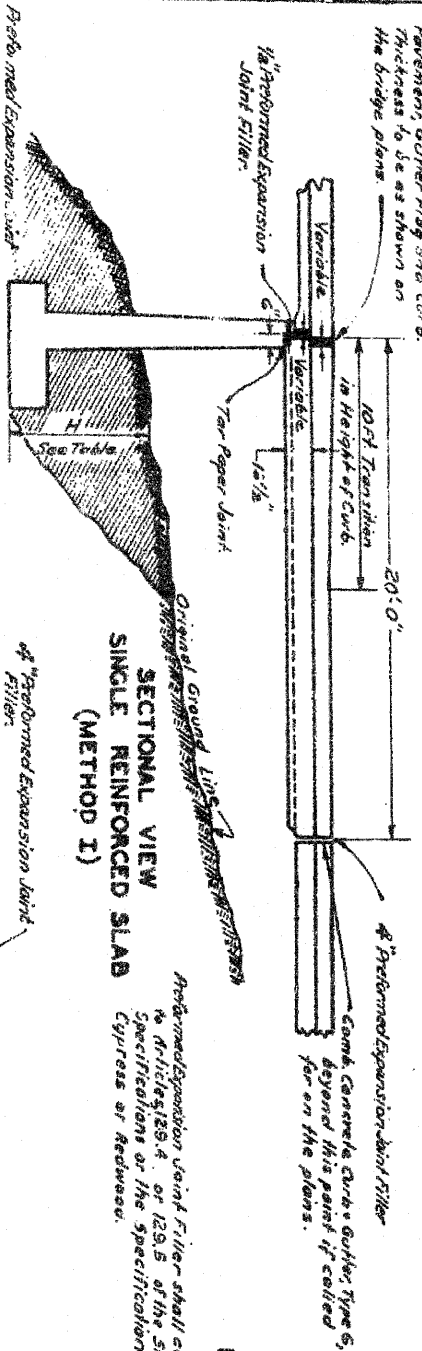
DETAILS OF BRIDGE APPROACHES USING COMBINATION CONCRETE CURB AND GUTTER TYPE 6
